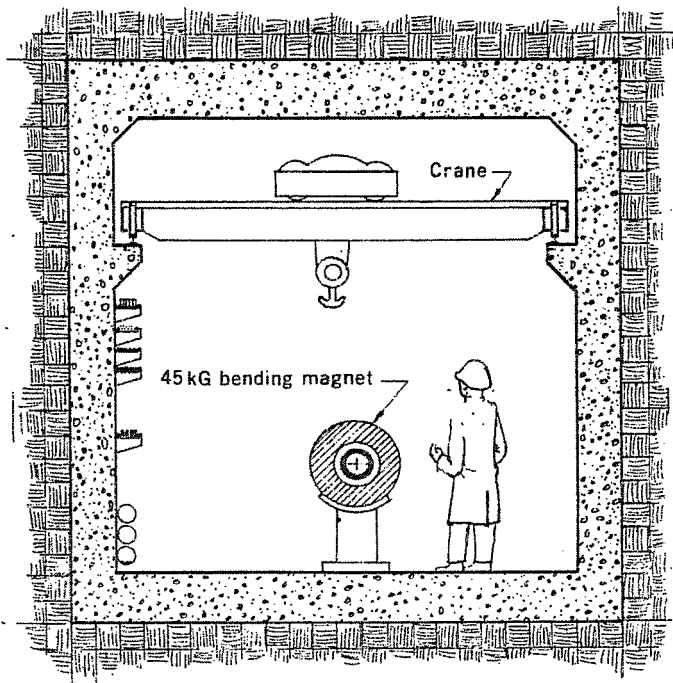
A typical tunnel cross section showing a 45 kG magnet installed in the tunnel.
